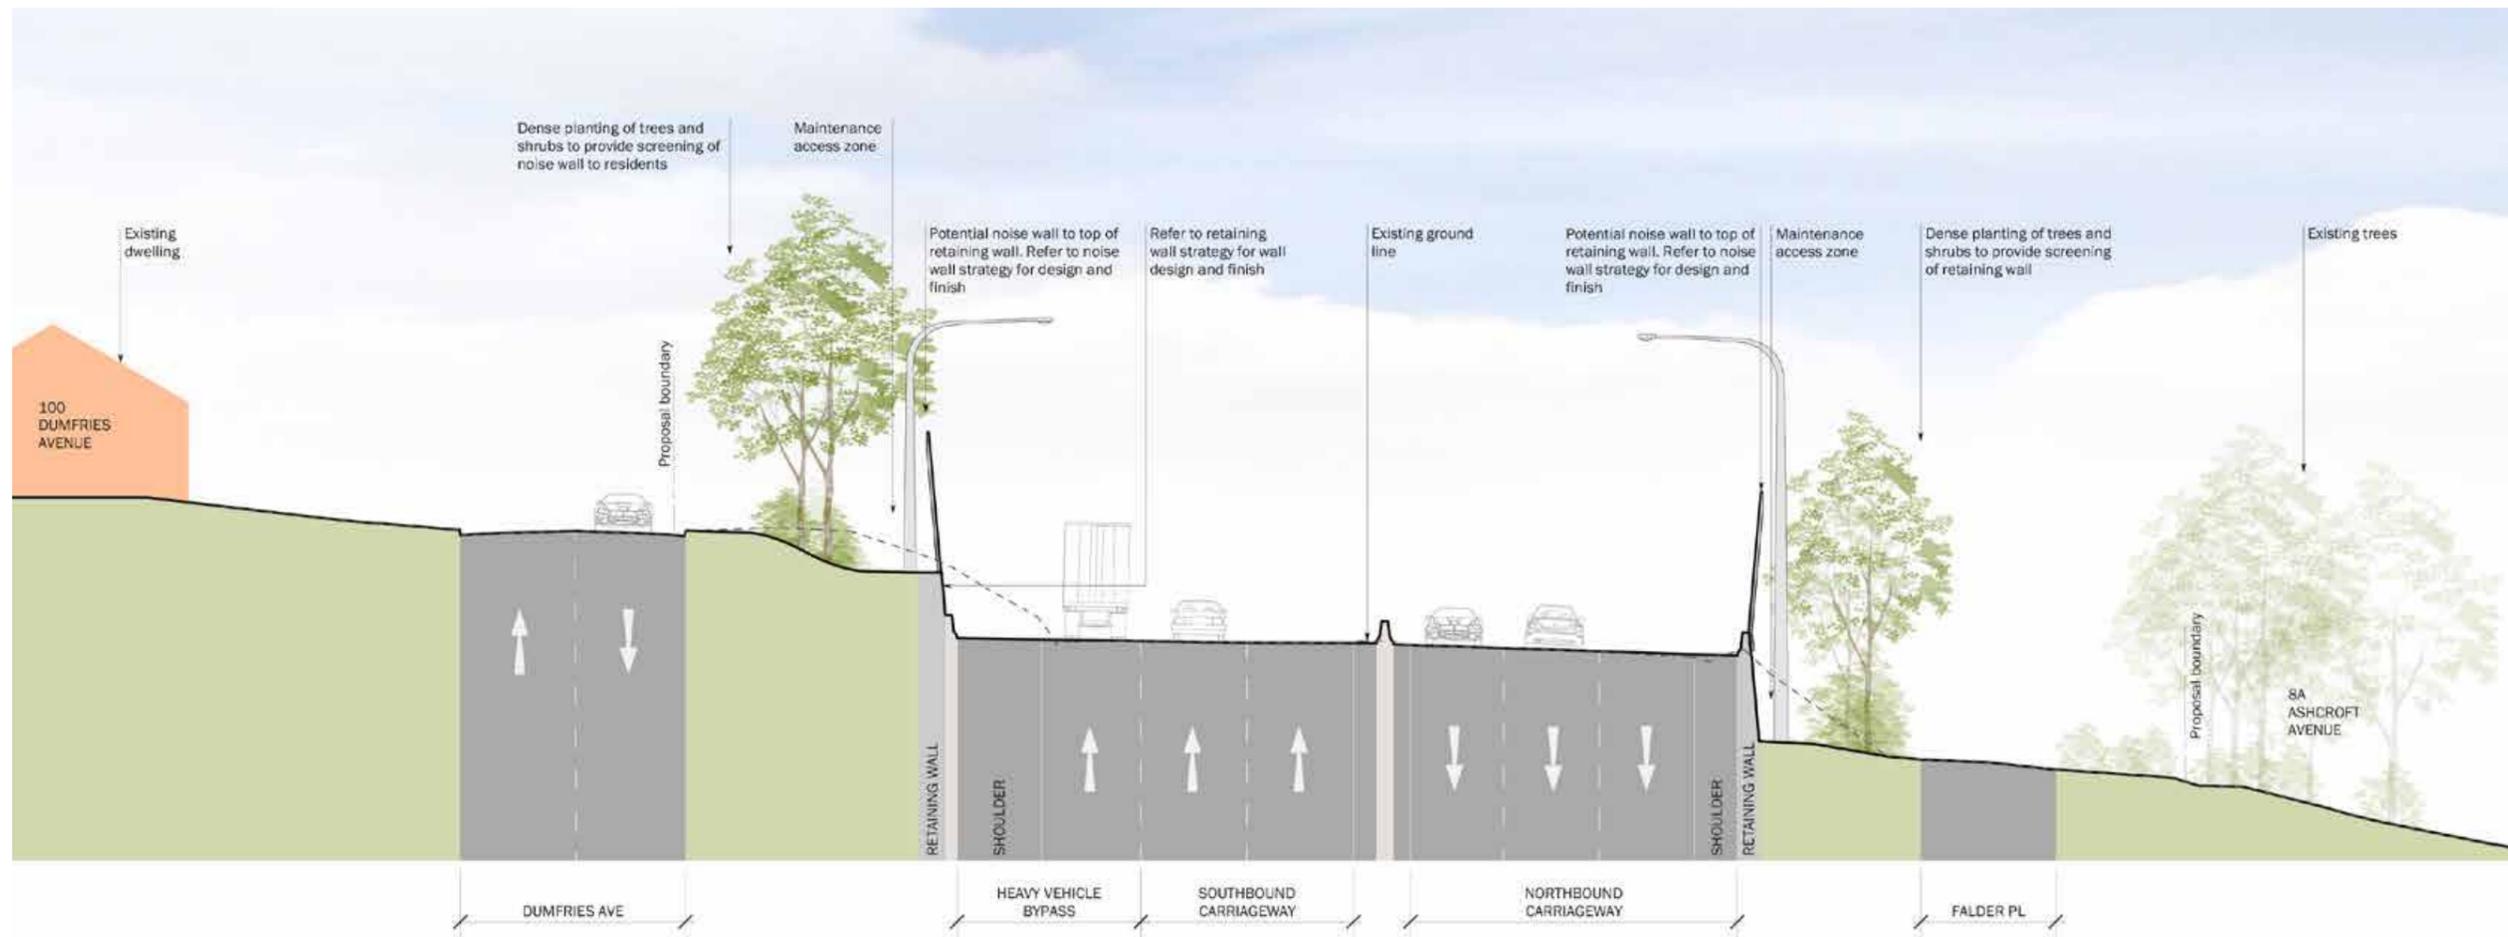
Section 1 through Princes Motorway west of Mount Ousley Road - Chainage 79000 (Scale 1:250)
